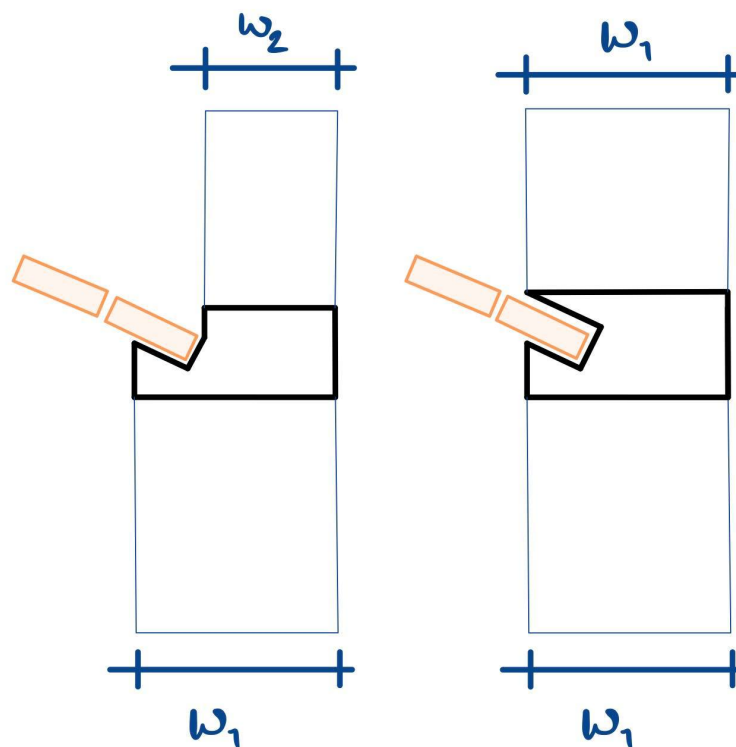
Sketch showing how the wall thickness can be adapted to the springer shape.
